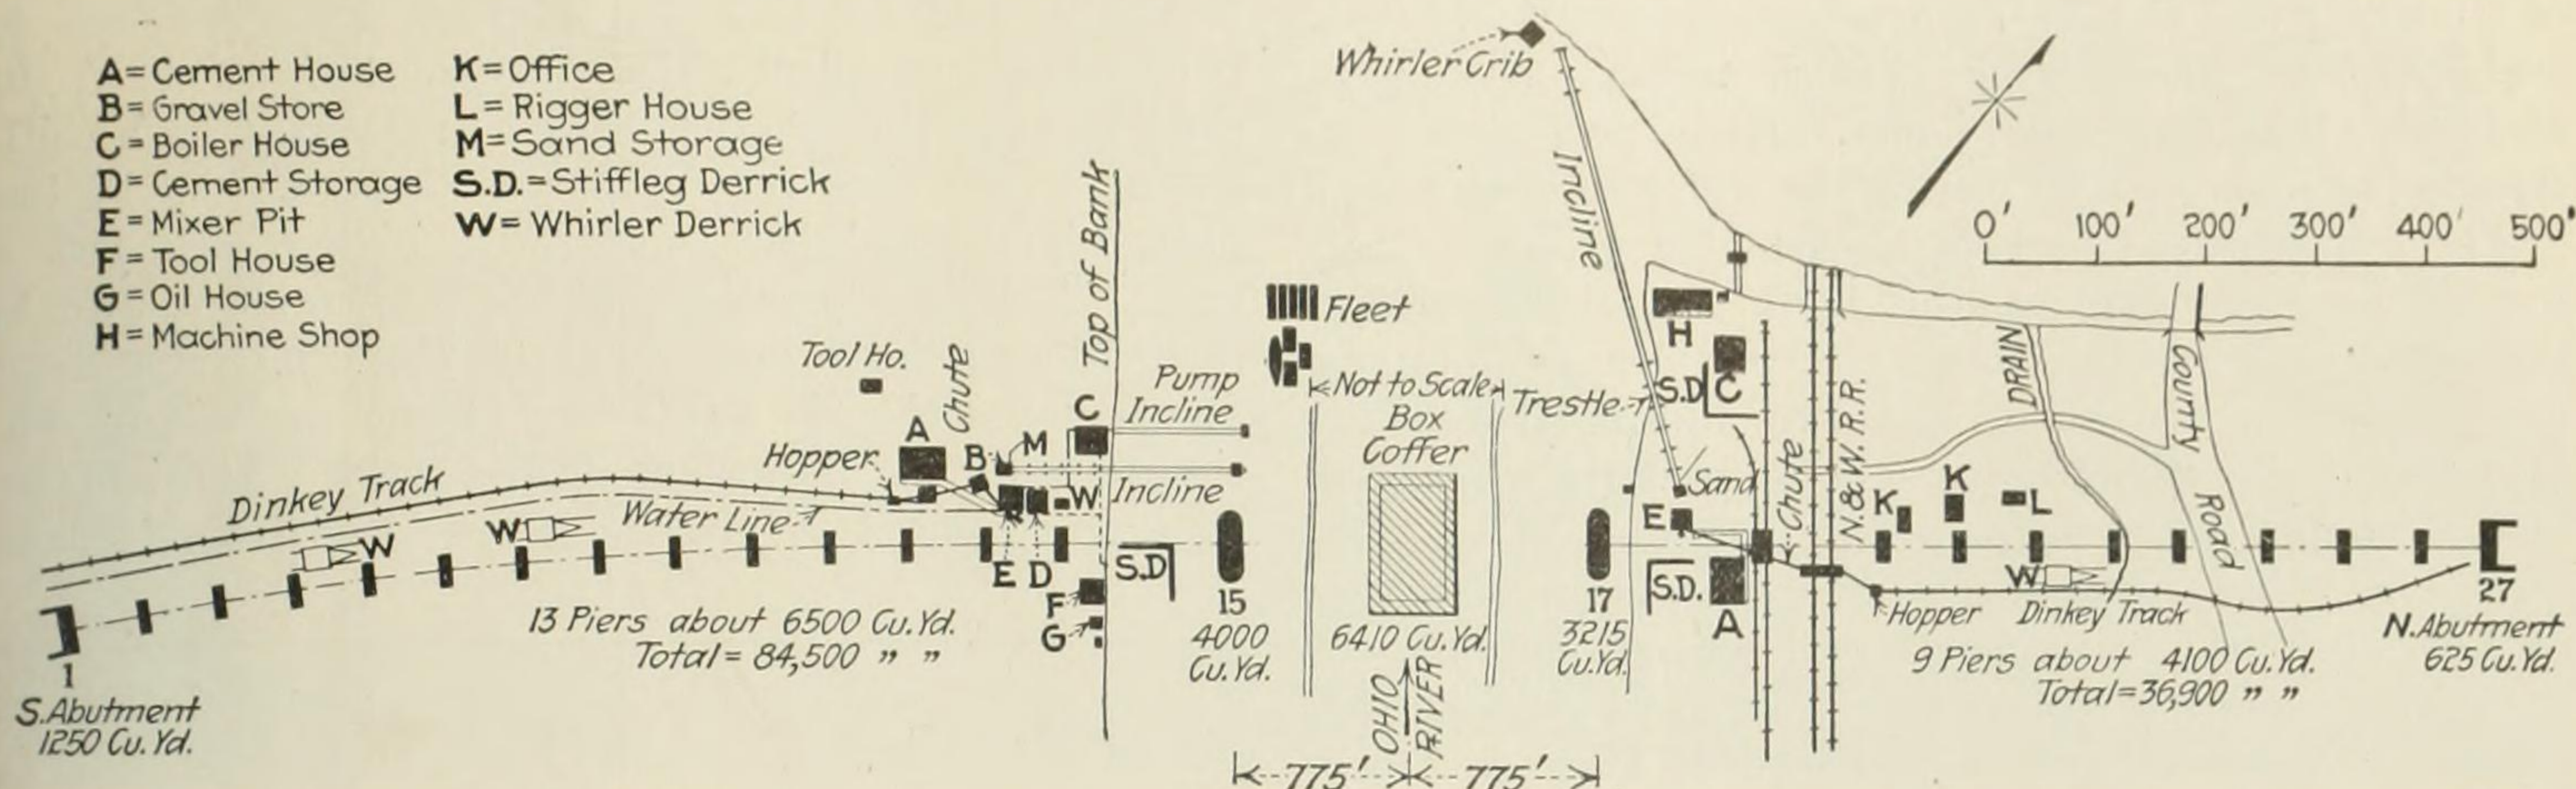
DRAVO CONTRACTING CO.'S PLANT LAYOUT FOR SUBSTRUCTURE WORK ON SCIOTOVILLE BRIDGES
